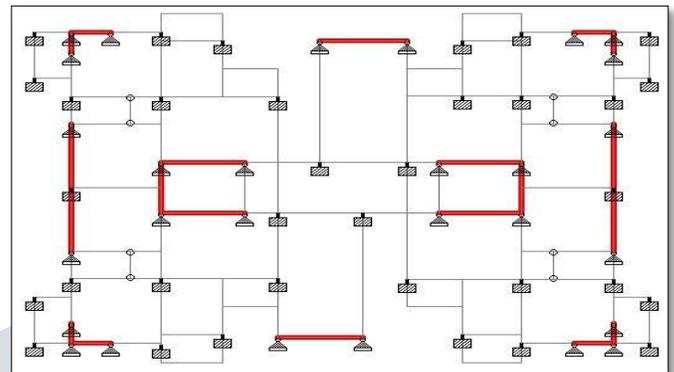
Plan view of building with satisfied RC Structural wall plan density
